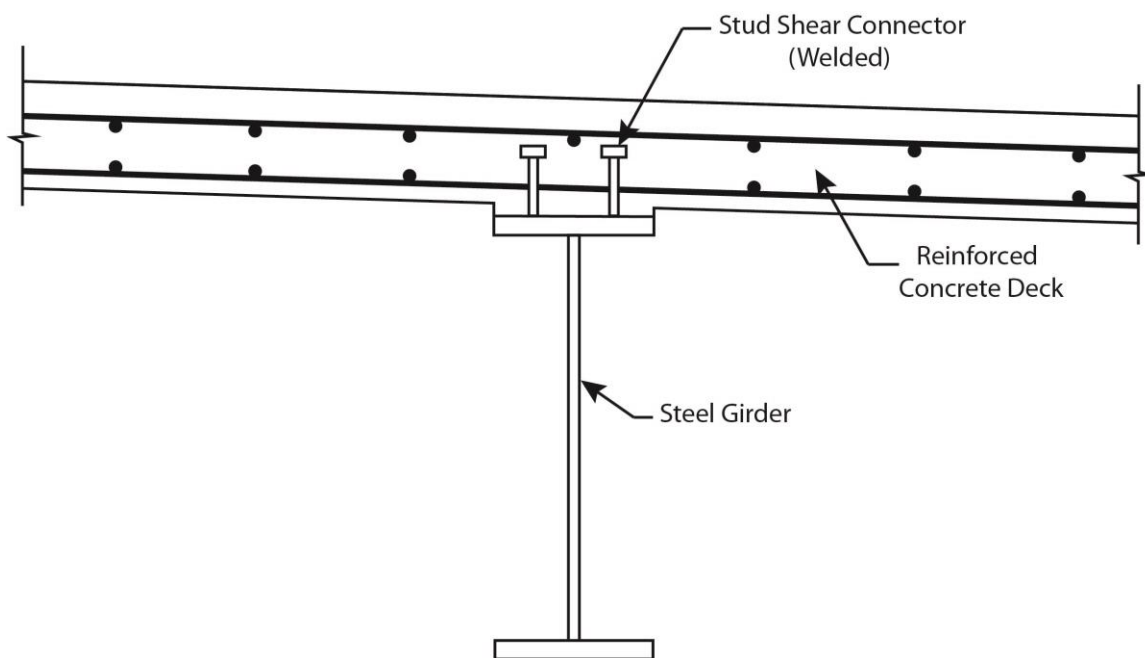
Composite Section Comprised of a Concrete Deck on a Steel Girder
